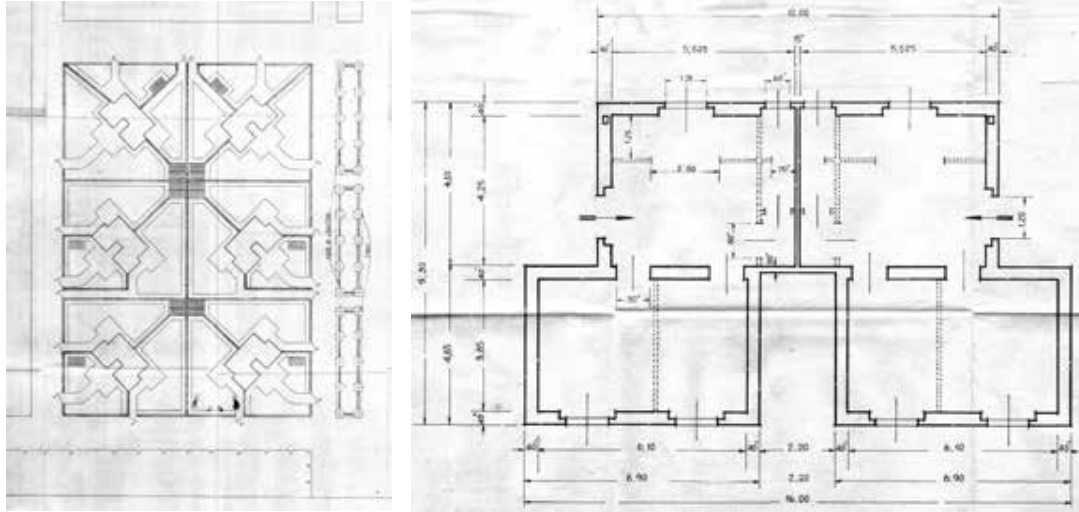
An Urban Unit "isolato" of detached houses in Villaggio del Littorio. A typical floor plan.
